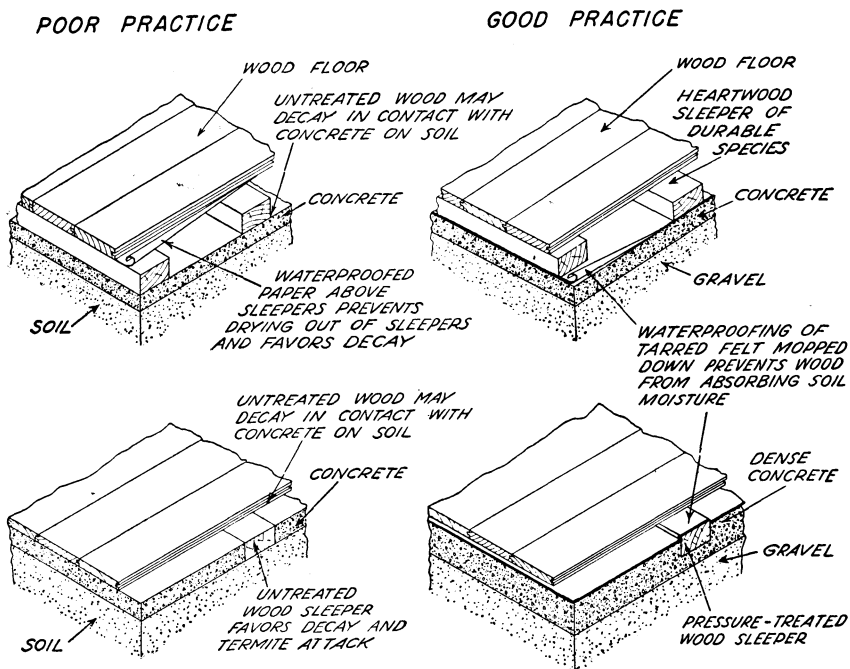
Wood floors on concrete slabs. Waterproofing membranes may be placed in or under the slab instead of on it.
